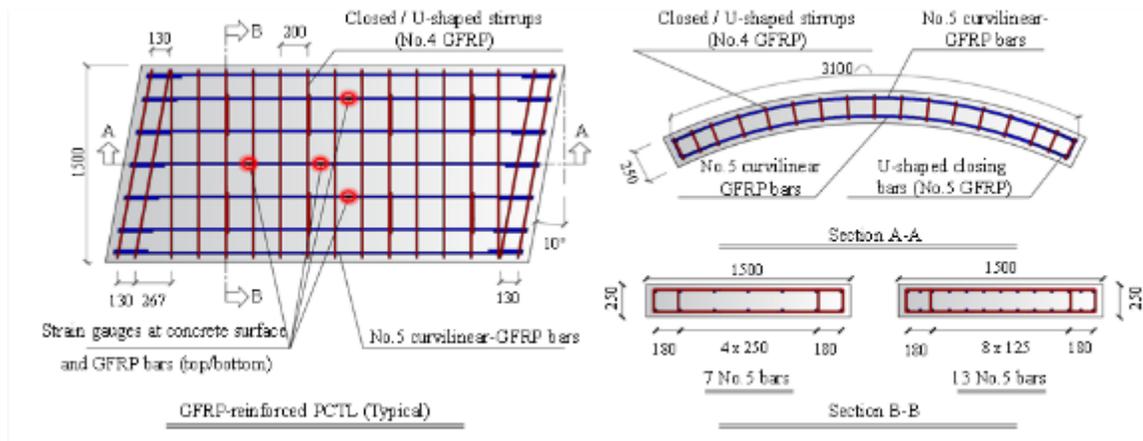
Reinforcement details for the test segments. (Note: all dimensions in mm)
